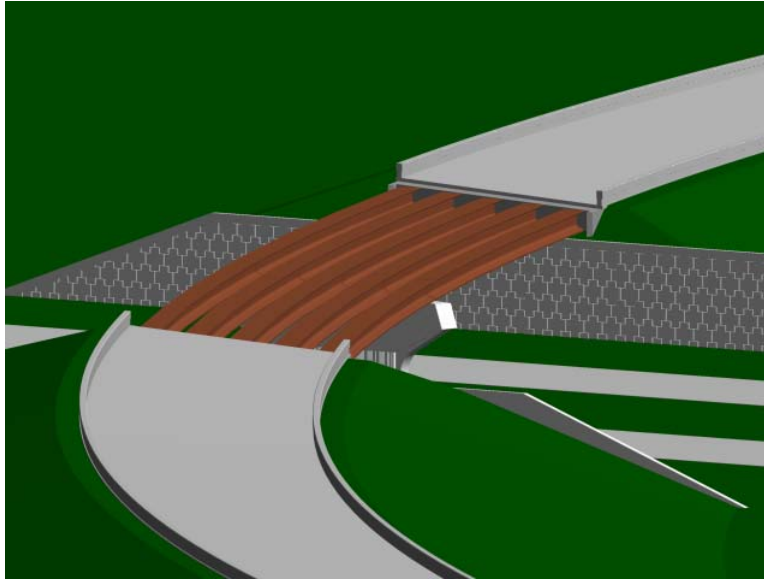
Preliminary Design using the Concrete NU (Nebraska University) I-girders
